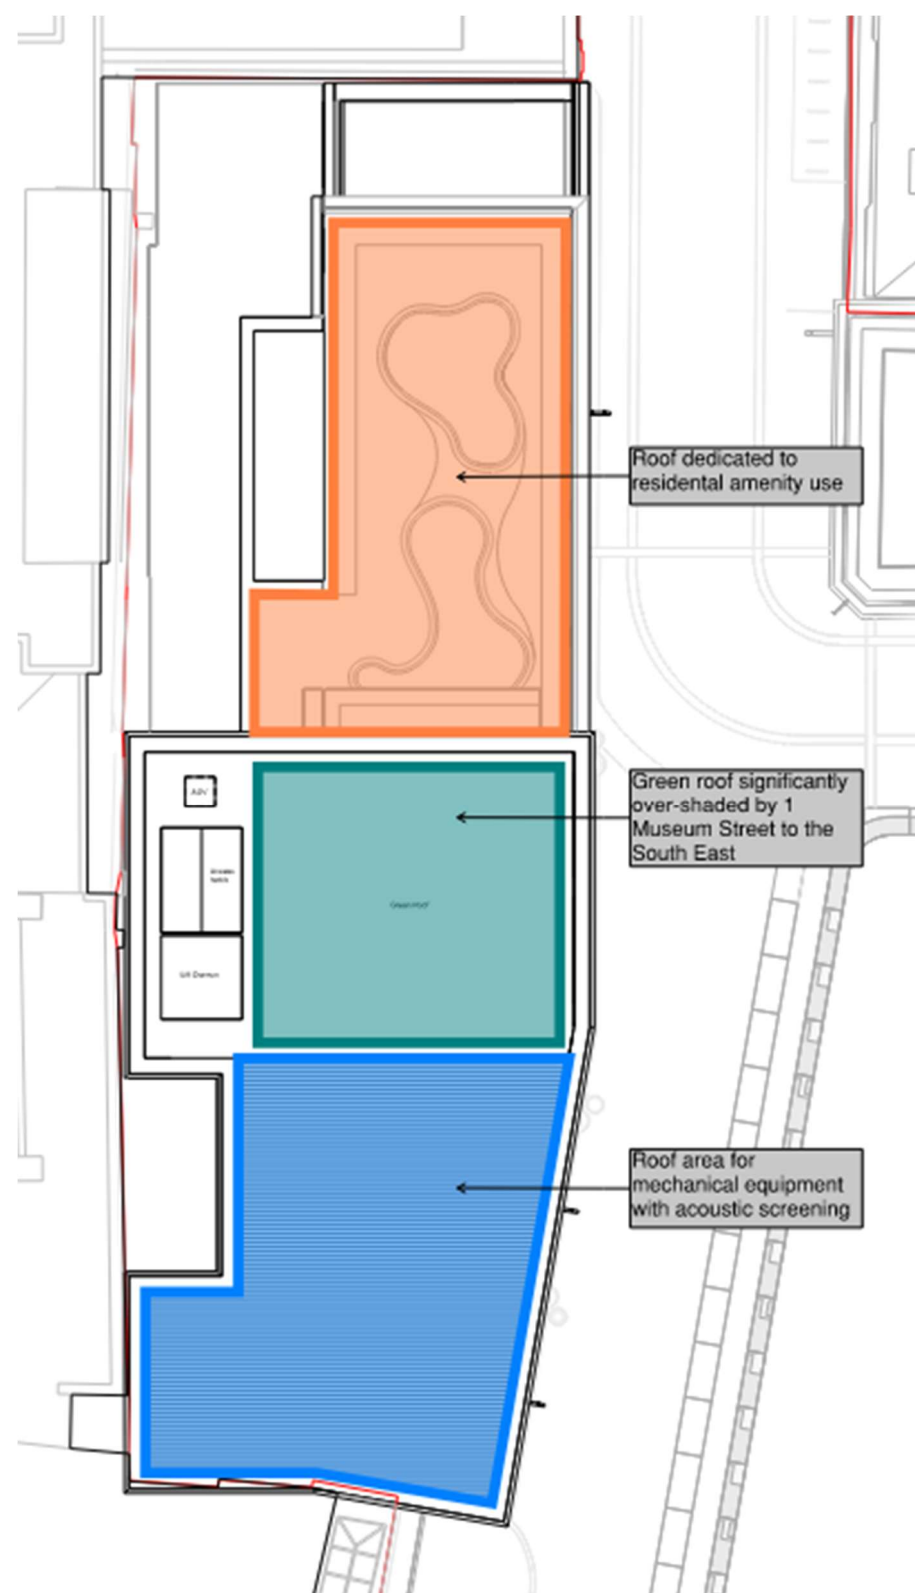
Vine Lane roof, allocated to both mechanical equipment and terrace, overshadowed by 1 Museum Street
